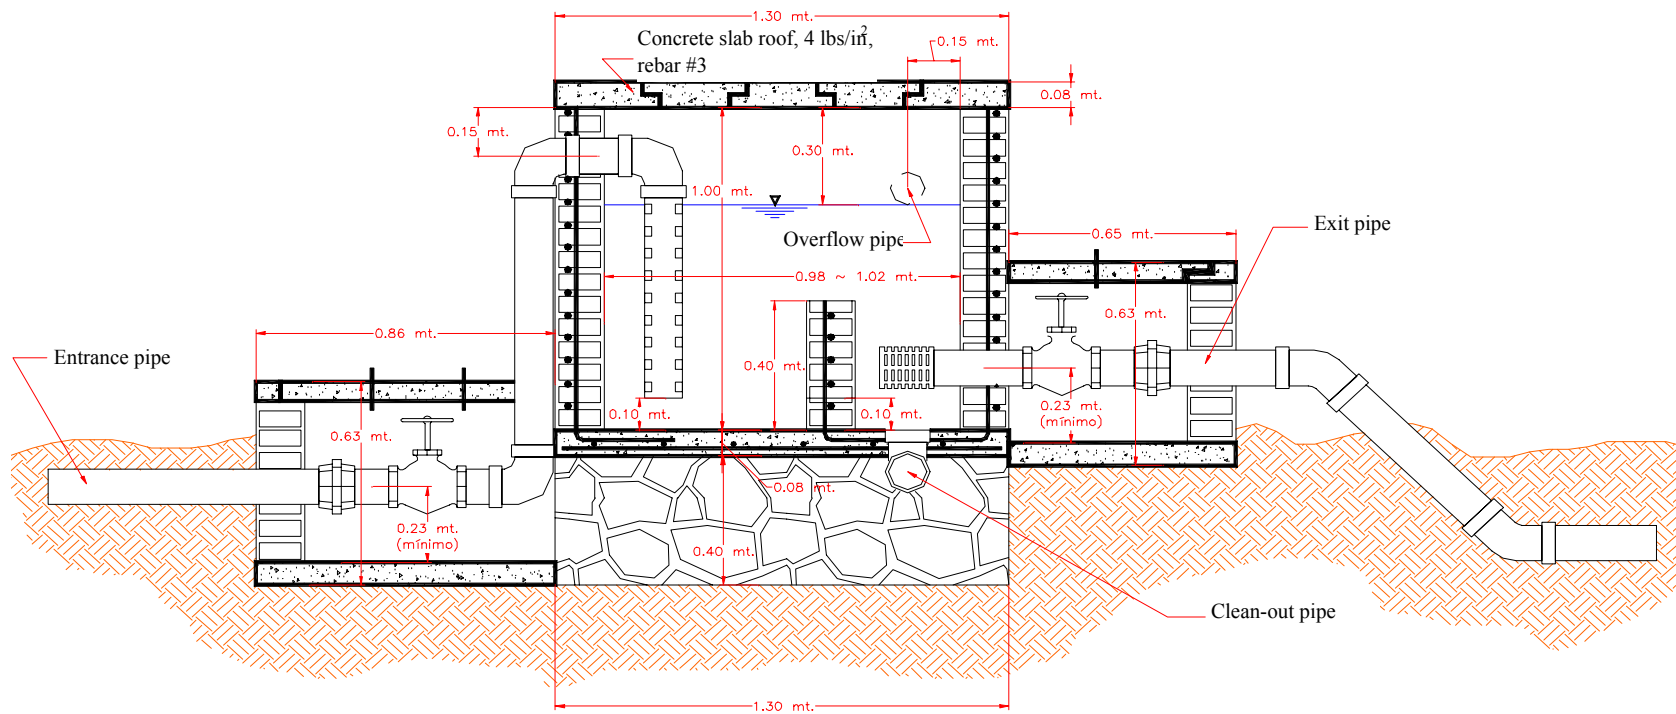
Plan view cross section of break pressure tank with details on rebar arrangement.
